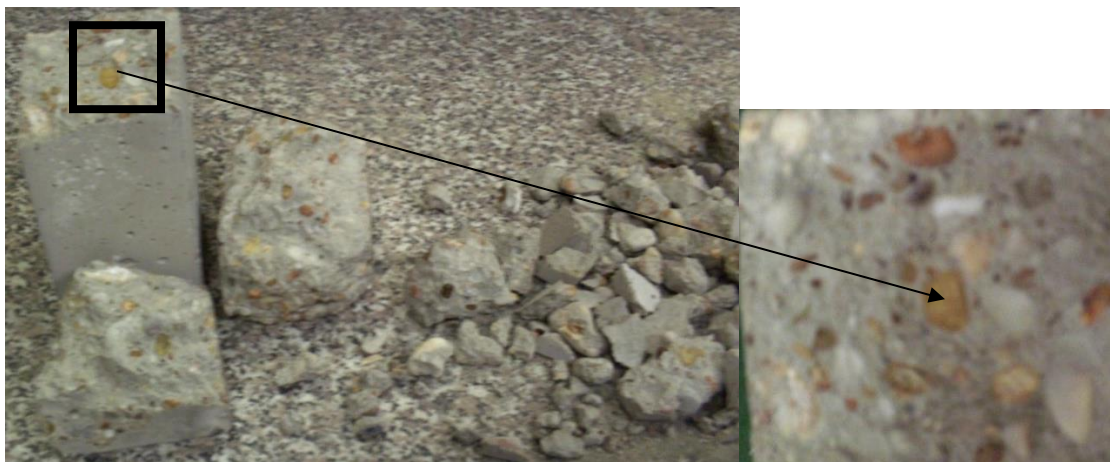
Damages of concrete block prepared from cement CEM I 42,5 R after a thermal load of 600 °C
